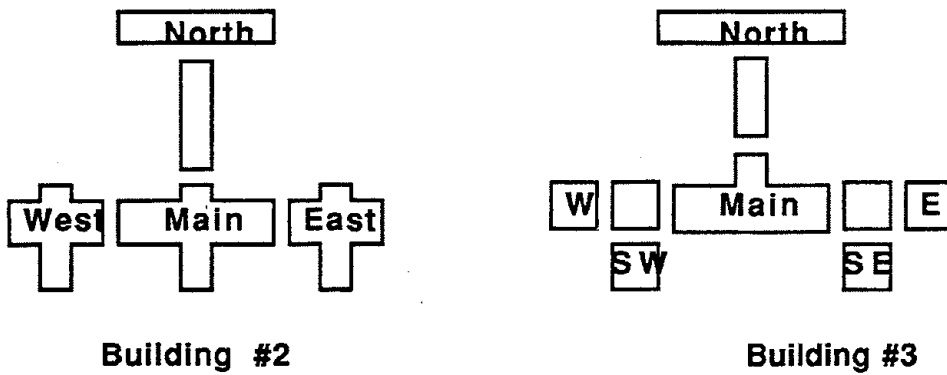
VA Medical Center. Plan view of Buildings #2 and #3.
